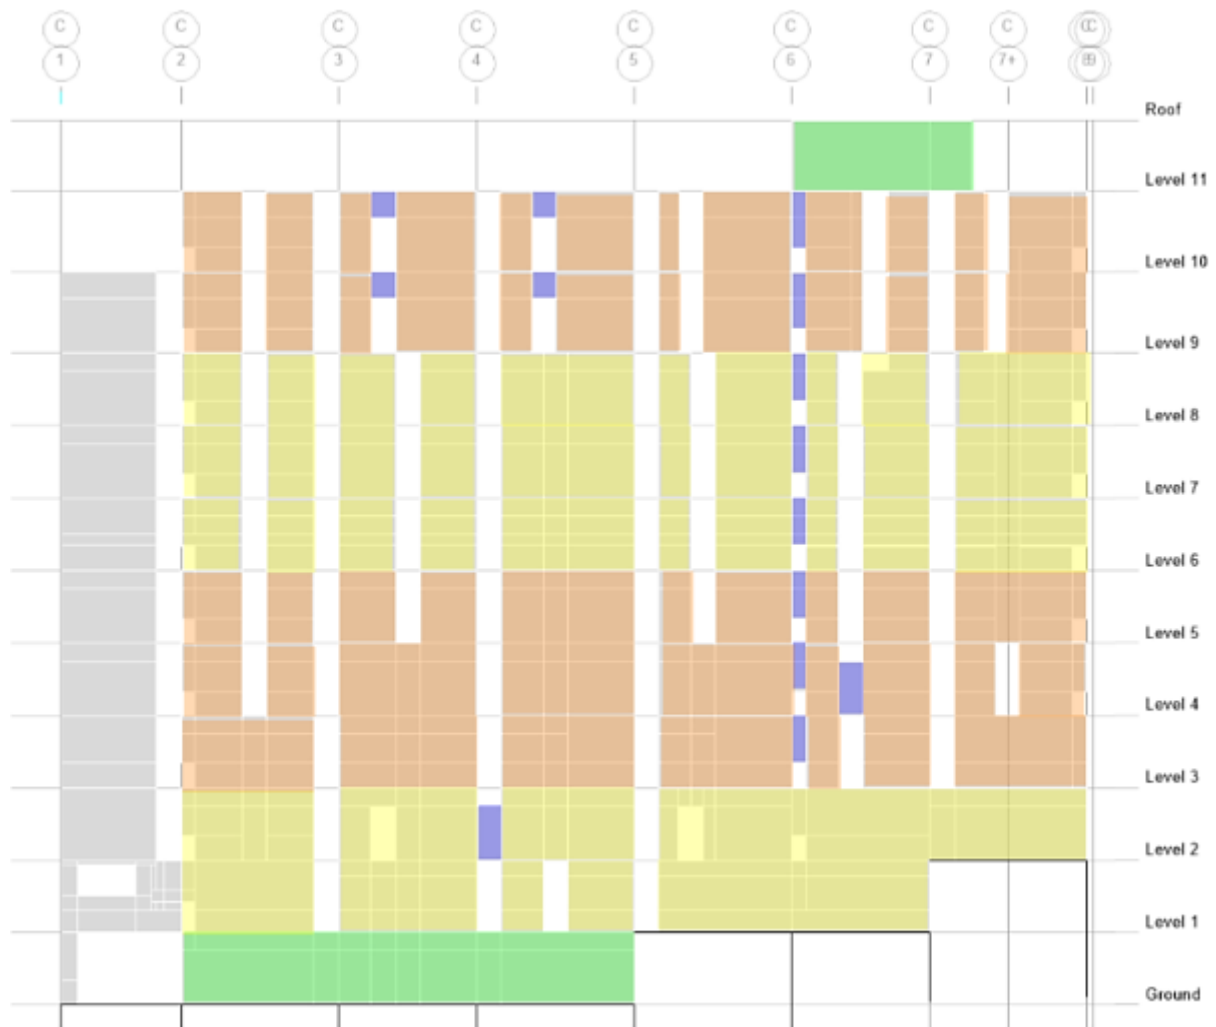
, Gridline C Longitudinal Direction Wall – North Structure
